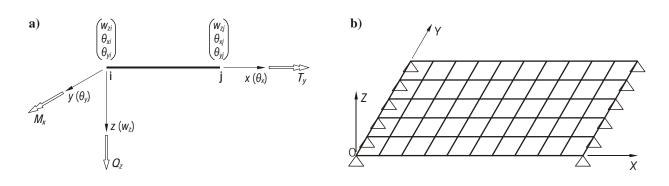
Grillage model: a) a single grillage element, b) grillage model of bridge
